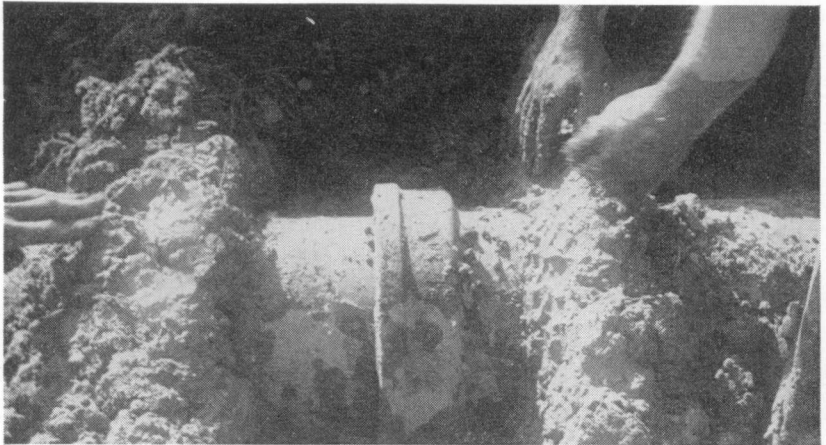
To prevent leakage and seepage, concrete collars are poured between the clay forms and around the connecting cast iron pipe joints.
